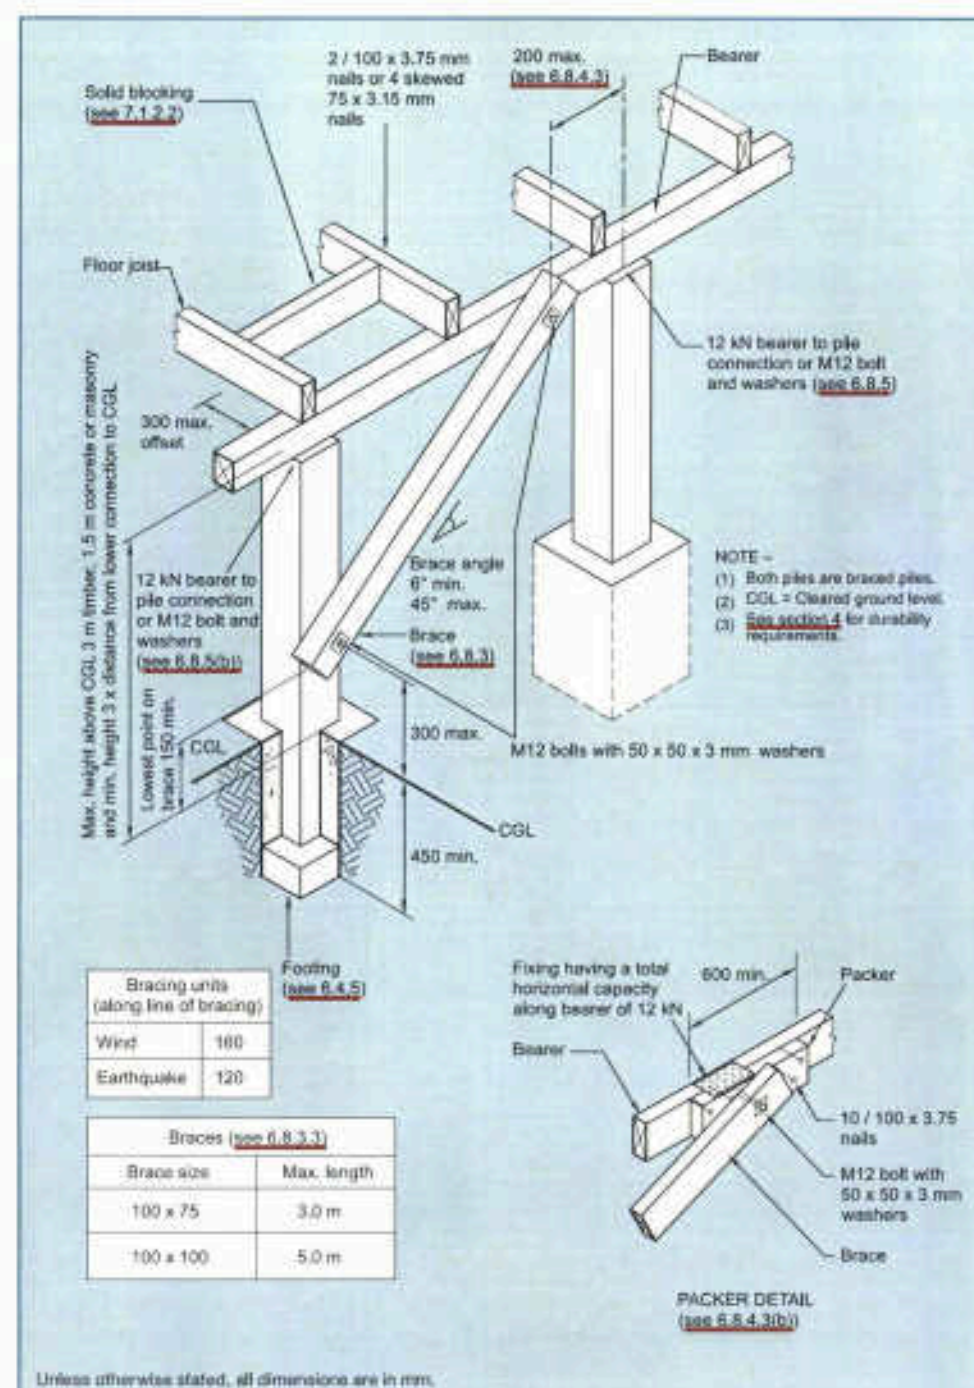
Braced pile system - Brace connected to bearer (see 6.8)
